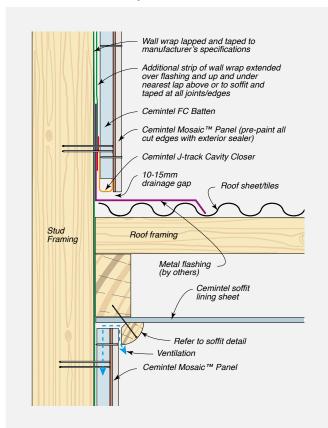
Junction of Mosaic Cladding with External Roofing
